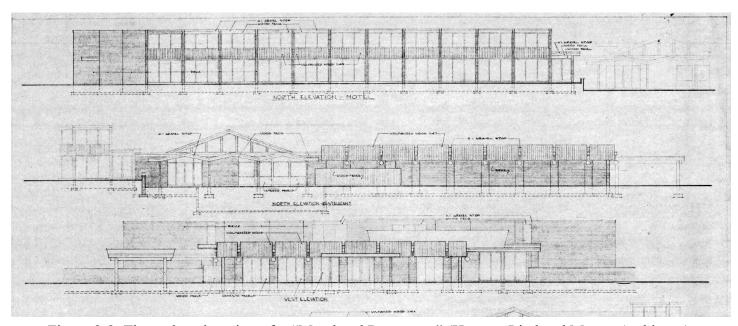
Three elevation views for "Motel and Restaurant" (Hansen, Lind and Meyer, Architects)
